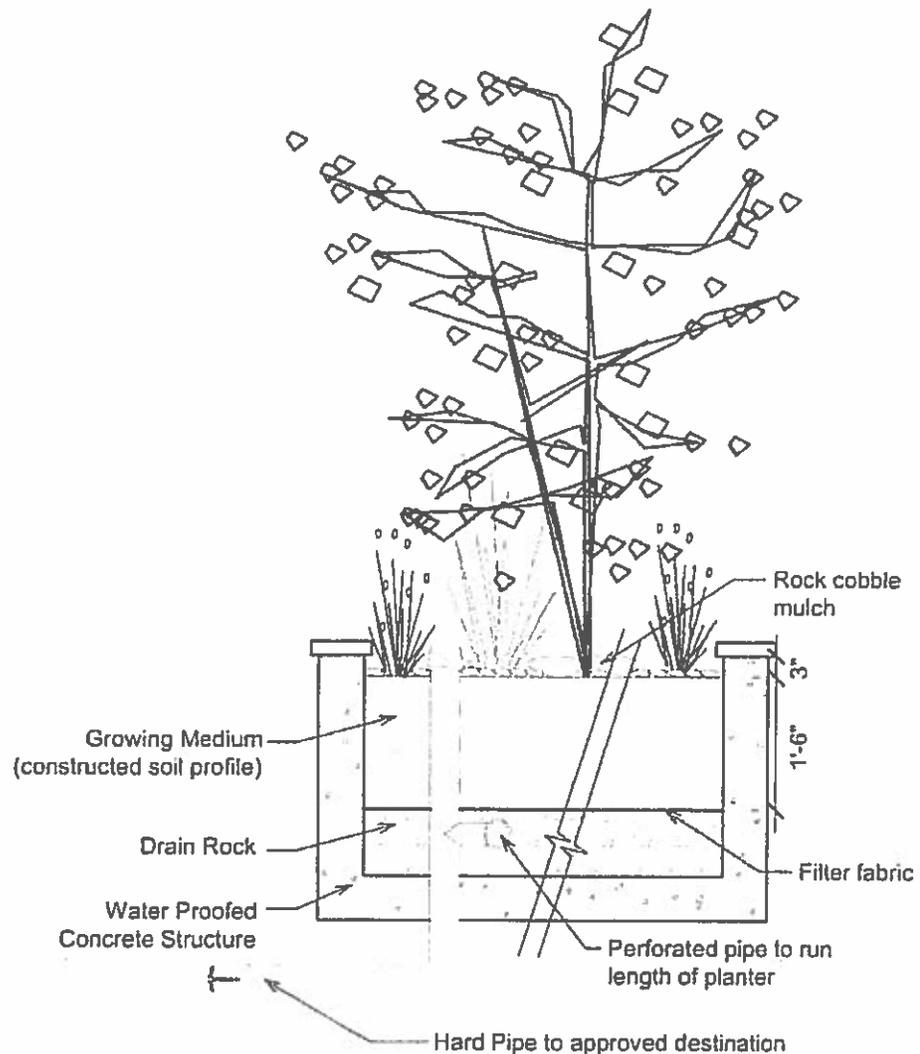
FLOW THROUGH PLANTER DETAIL (EXAMPLE)
